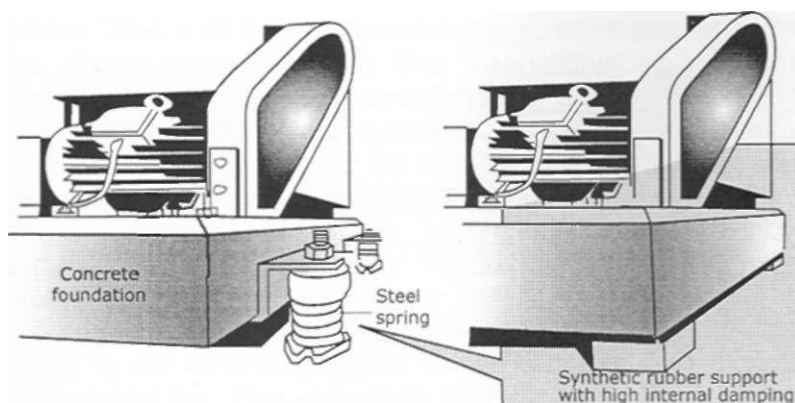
Isolating vibration by placing heavy vibrating equipment on inertial block with vibration isolators and dampers.
